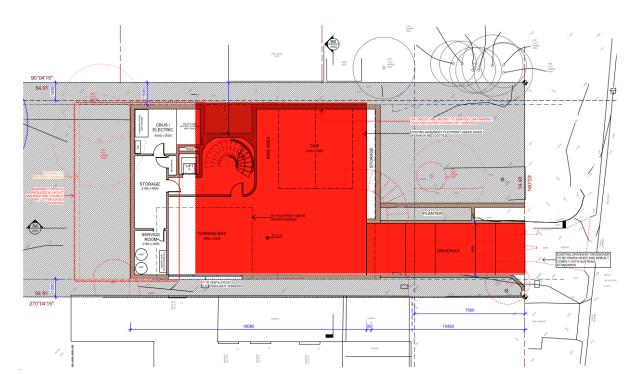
Existing Basement Level (Source: Architectural plans drawn over by Council's Planner)
